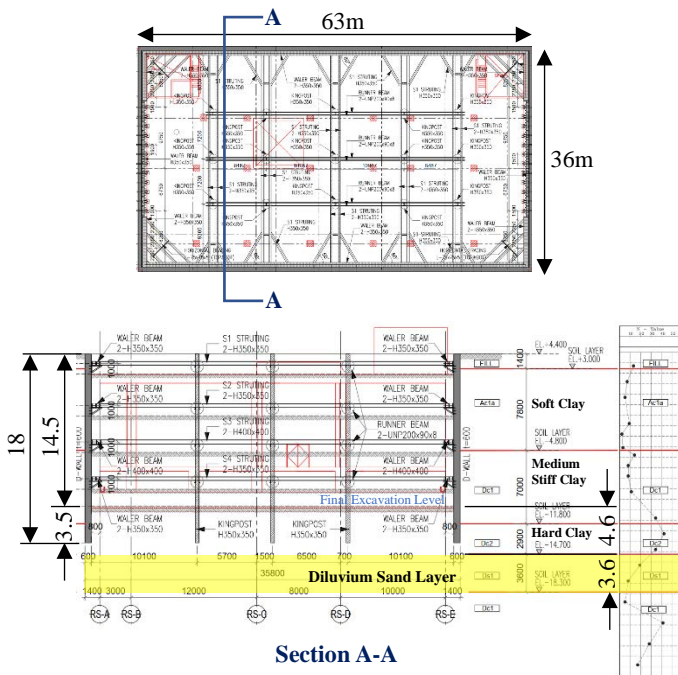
structural plan, elevation, and geotechnical condition of basement structure
